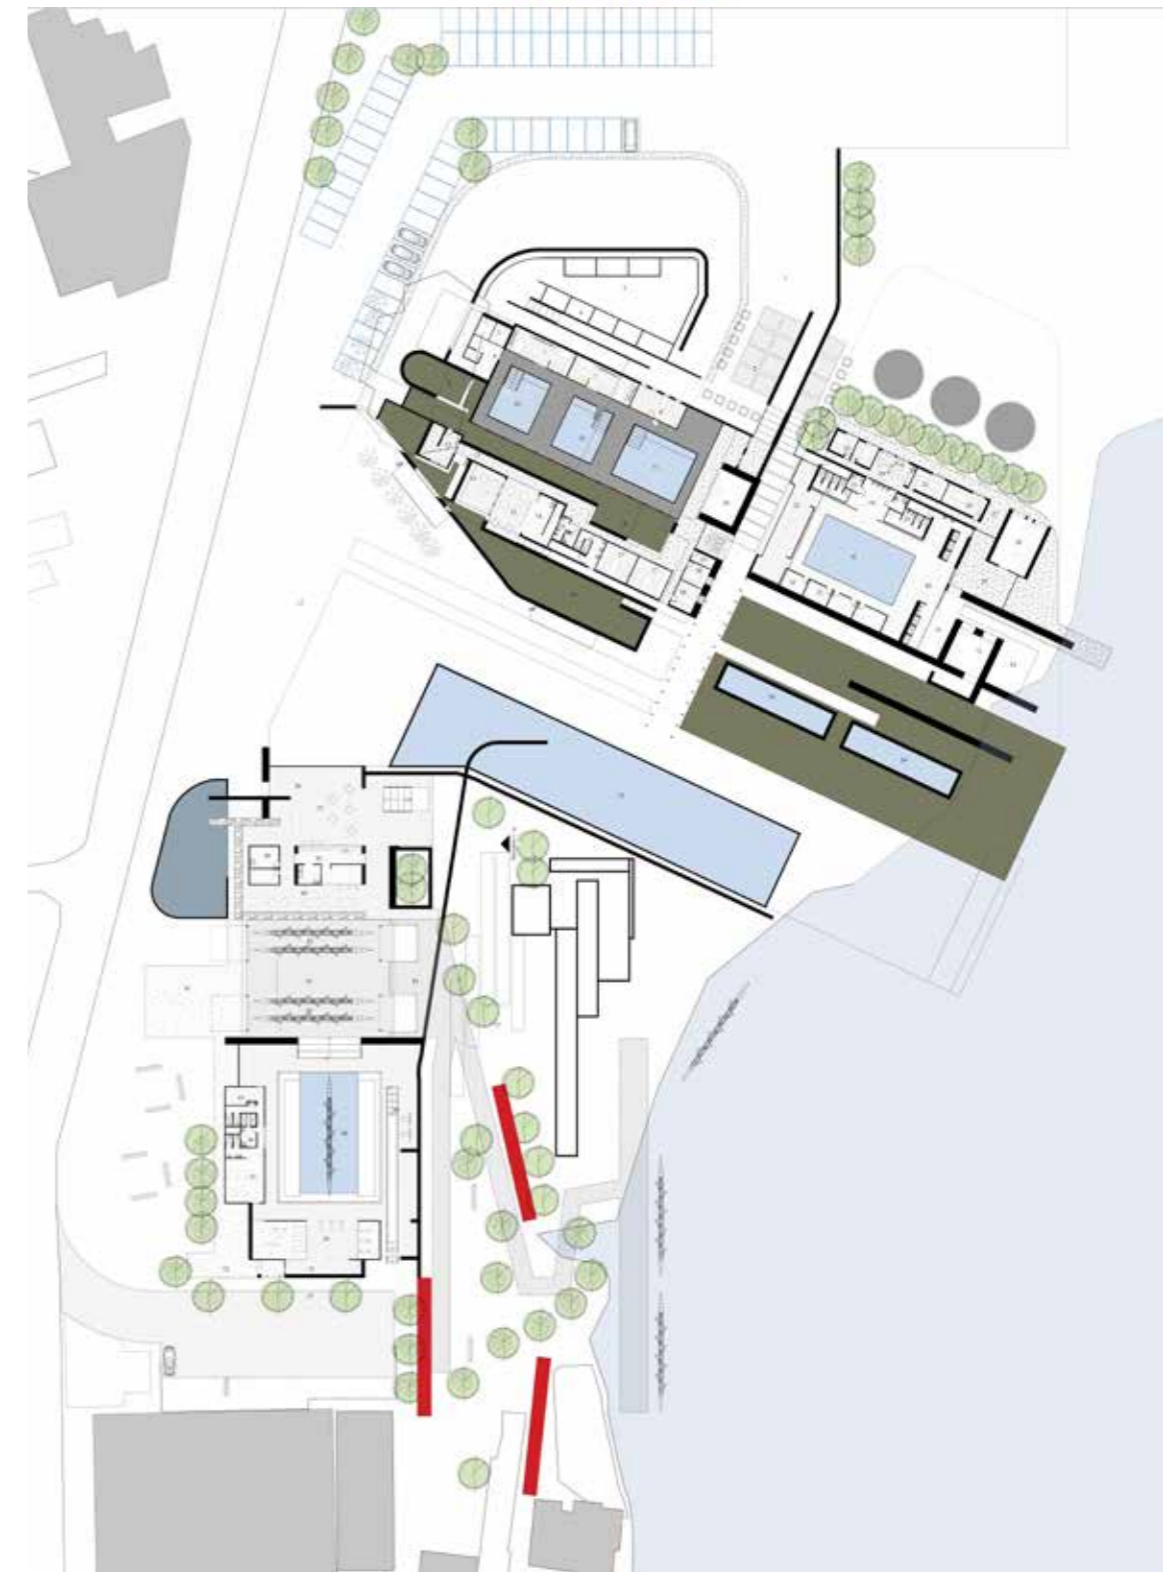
Floor plan iteration 02 (Author, 2019)
